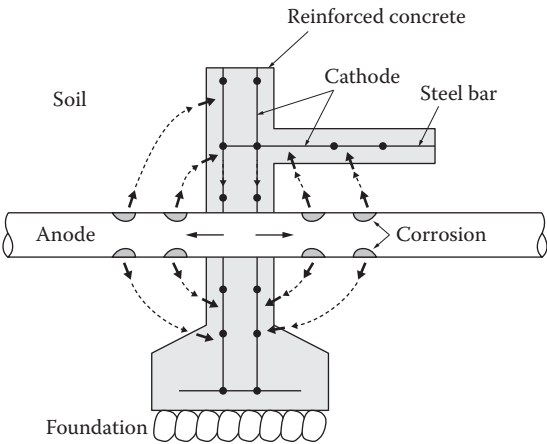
Corrosion at the boundary of pipe and RC concrete.
